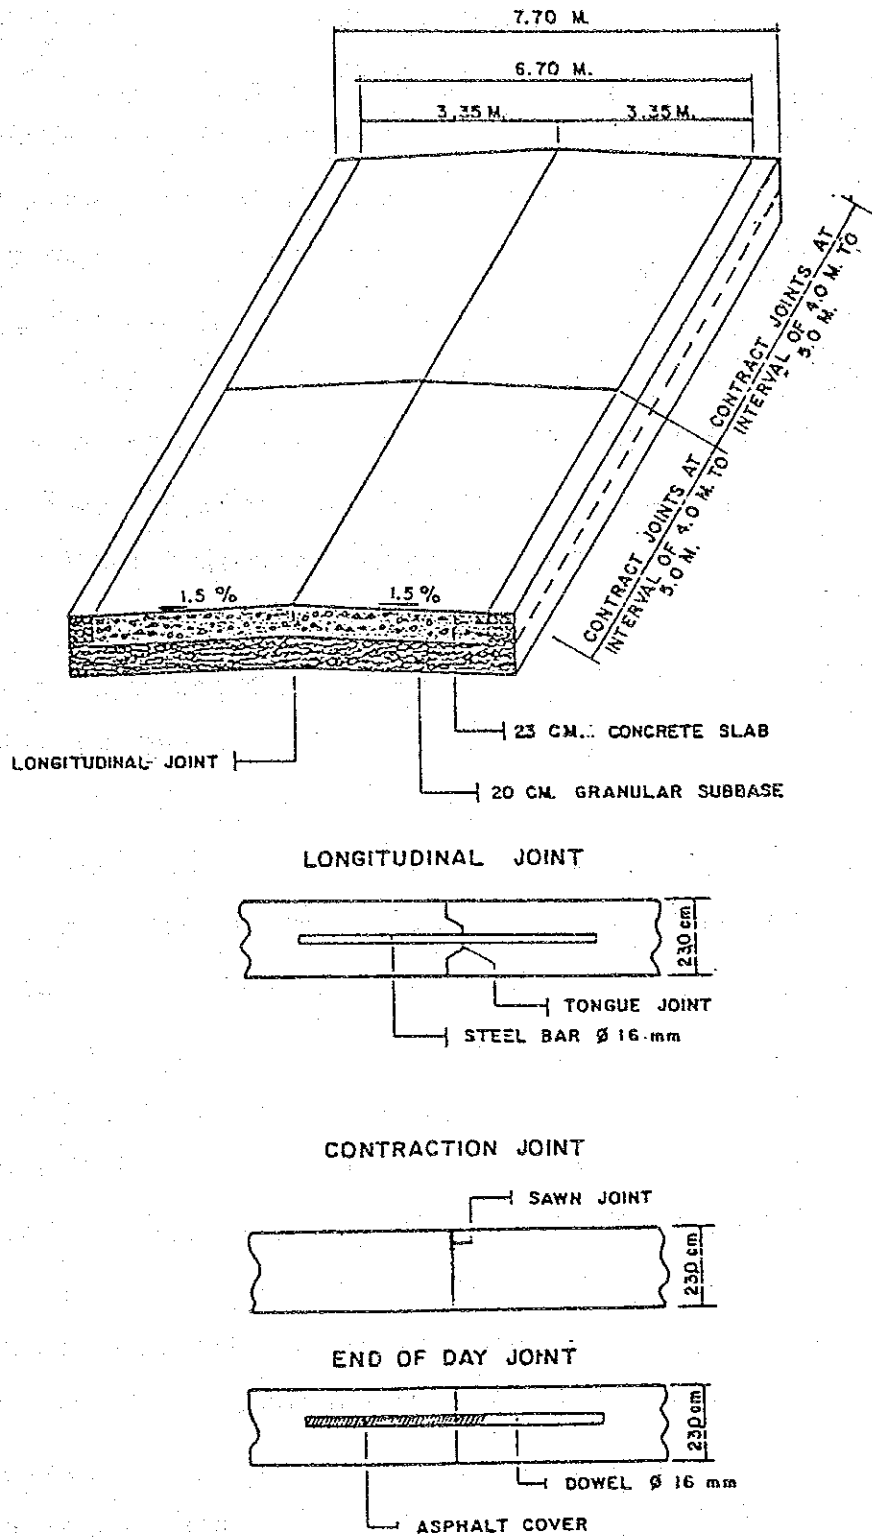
STANDARD PAVEMENT STRUCTURE OF THE STUDY SECTION
